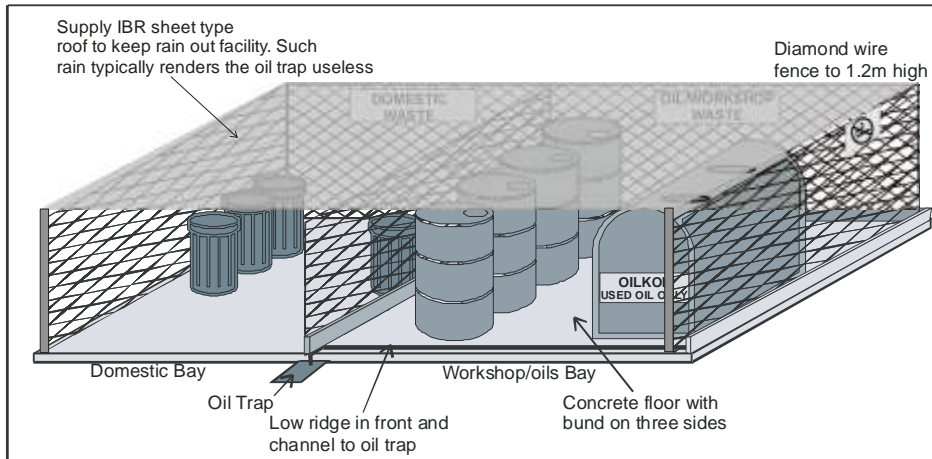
Design Guidelines for industrial and domestic waste temporary storage facility
